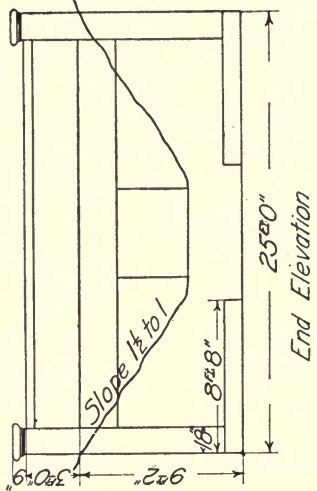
REINFORCED CONCRETE BOX CULVERT AT LENOX, MASSACHUSETTS.
